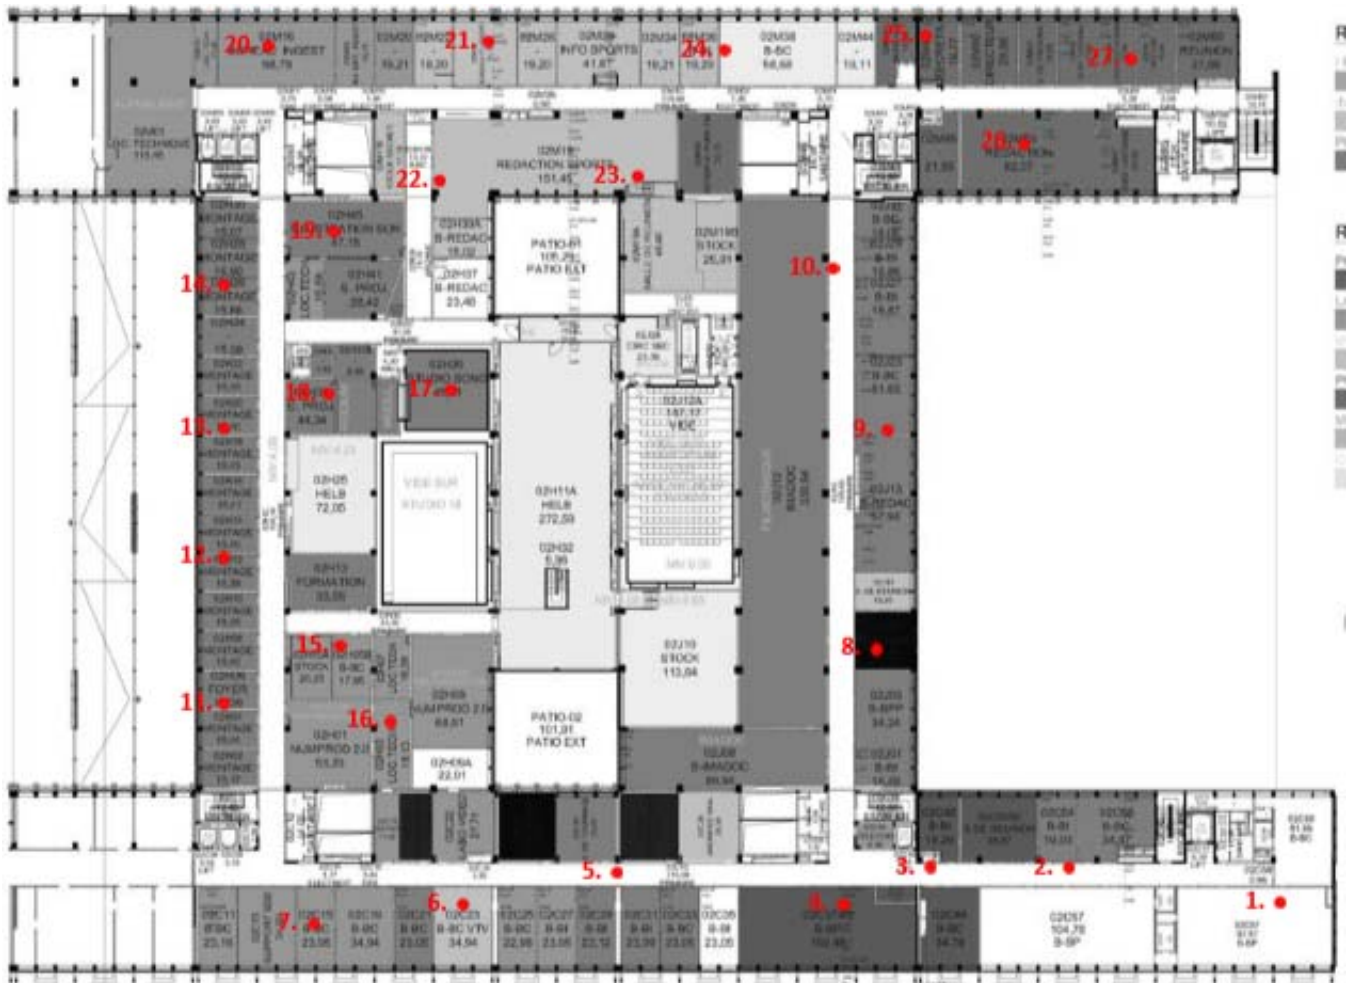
Placement Access Points for Floor 2 in Building PUVQ
